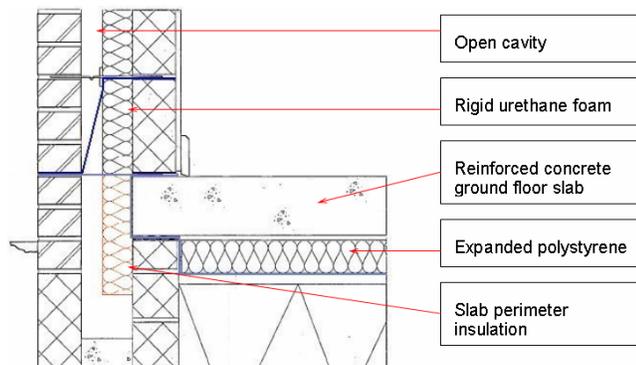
Typical ground floor slab perimeter detail partial-fill masonry construction.
